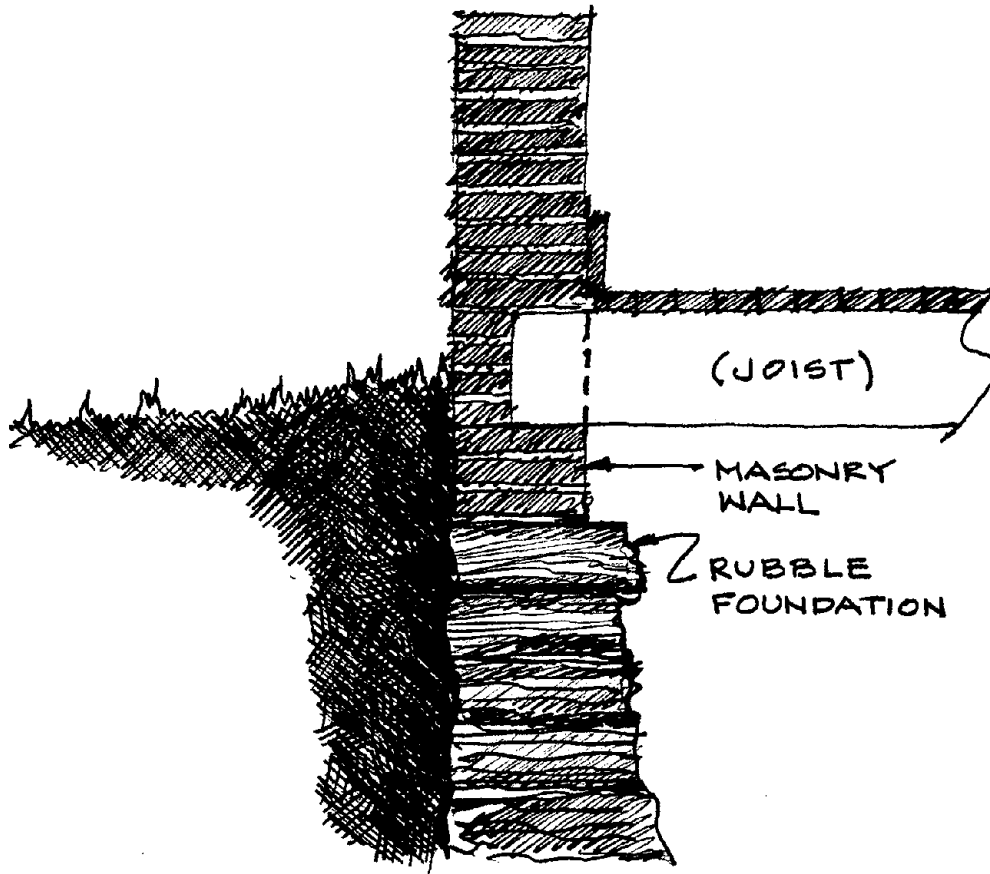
Diagram depicting what was a common condition found in many of the survey buildings. Rotten joist ends, water damaged masonry, poor wall/foundation connection
